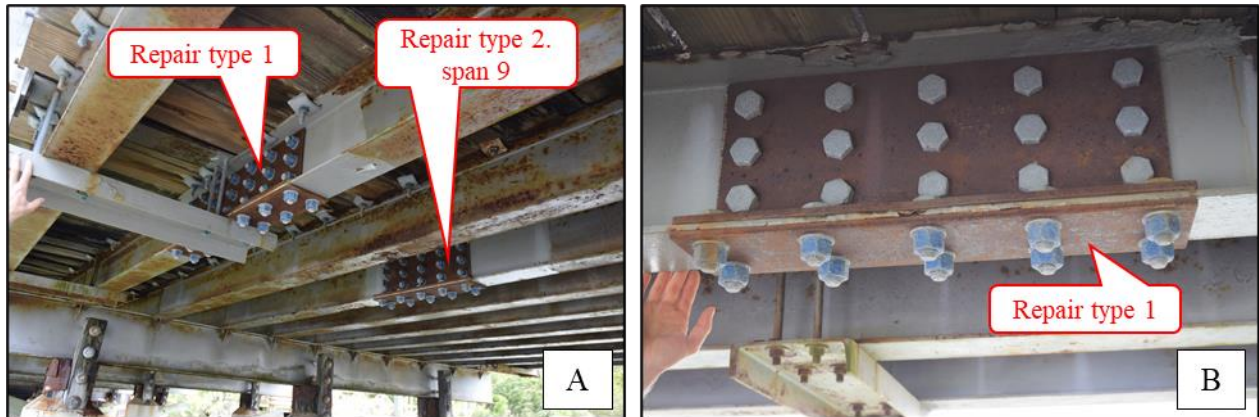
Photographs of Bolted Repair Types 1 and 2 Made of 50CR Steel and Galvanized Fastener Assemblies on the Onancock Bridge: (A) general view of both repairs; (B) close-up of Repair Type 1.
